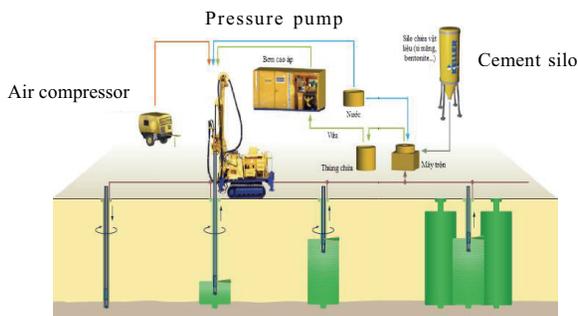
Schematic diagram of equipment and construction procedure of high pressure jet grouting pile
